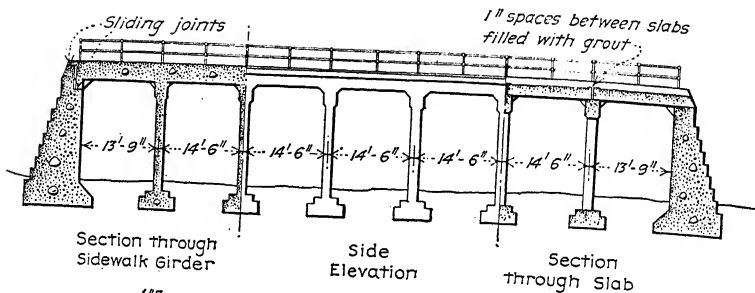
Details of Mozart Street subway, Bloomingdale Road track elevation, Chicago, Milwaukee & St. Paul Railway.
